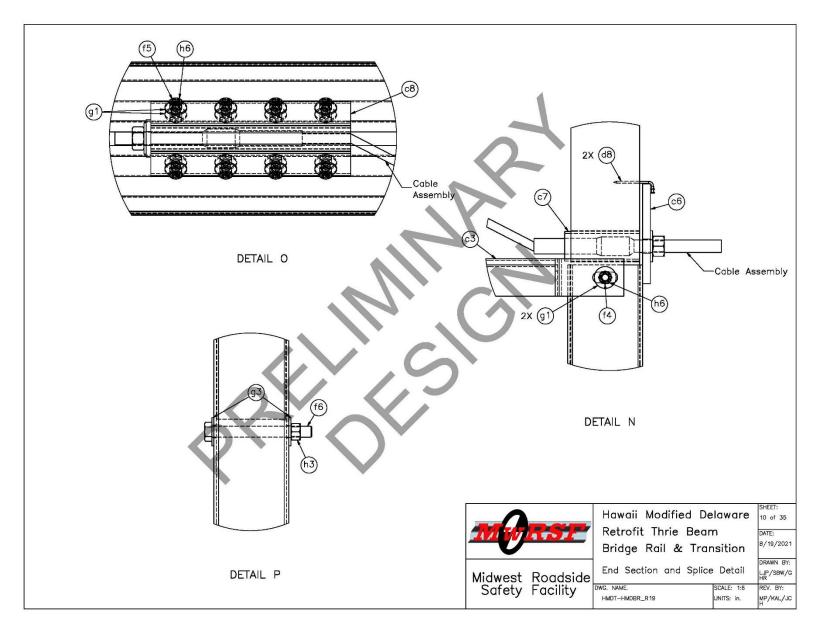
End Section and Splice Detail, Test No. HMDT-1
